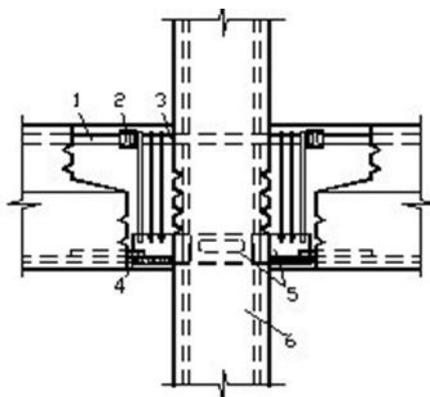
The joint with hidden steel corbels: 1 — beam reinforcement; 2 — welding; 3 — column reinforcement; 4 — strengthened reinforcement; 5 — angle steel corbel with hole for grouting; 6 — column.
